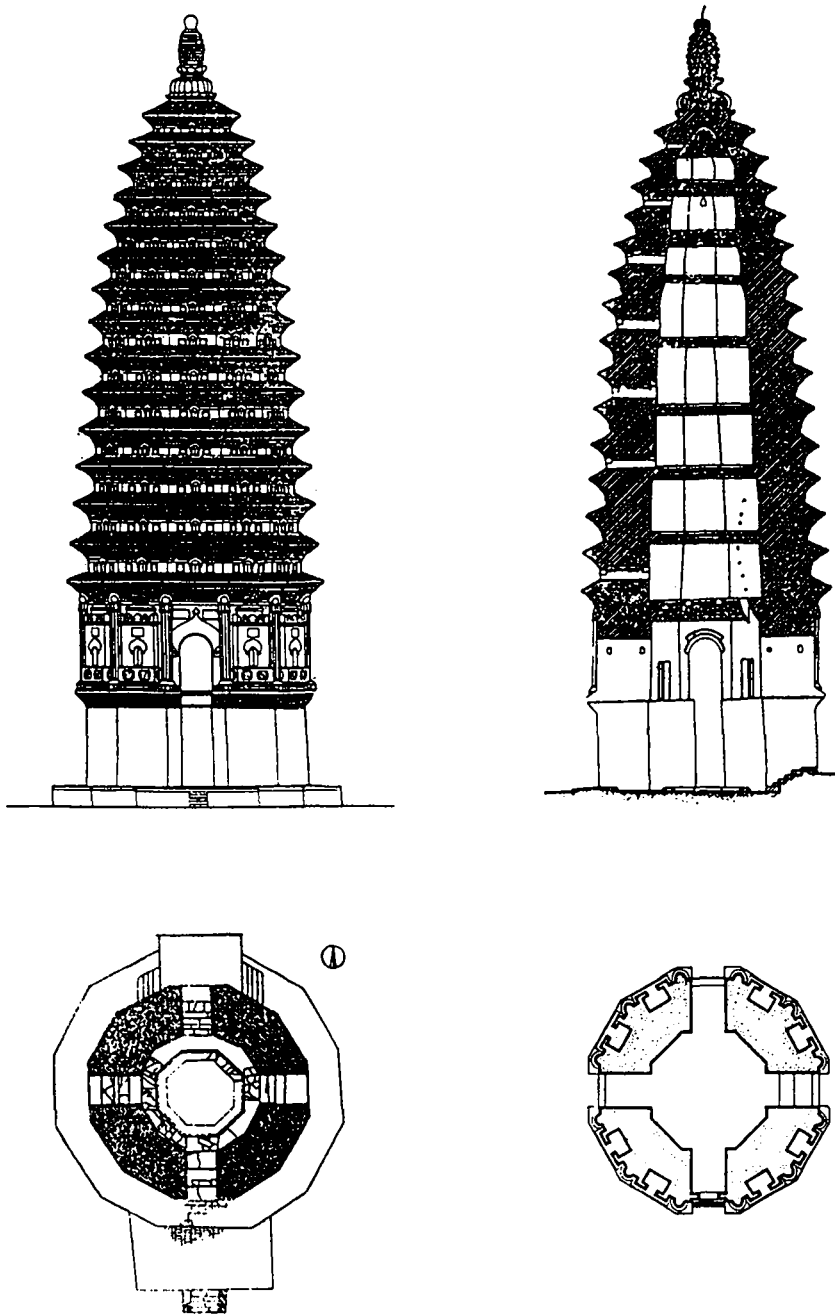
2 plans, elevation and section of the dodecagonal brick pagoda of Songyue-si
